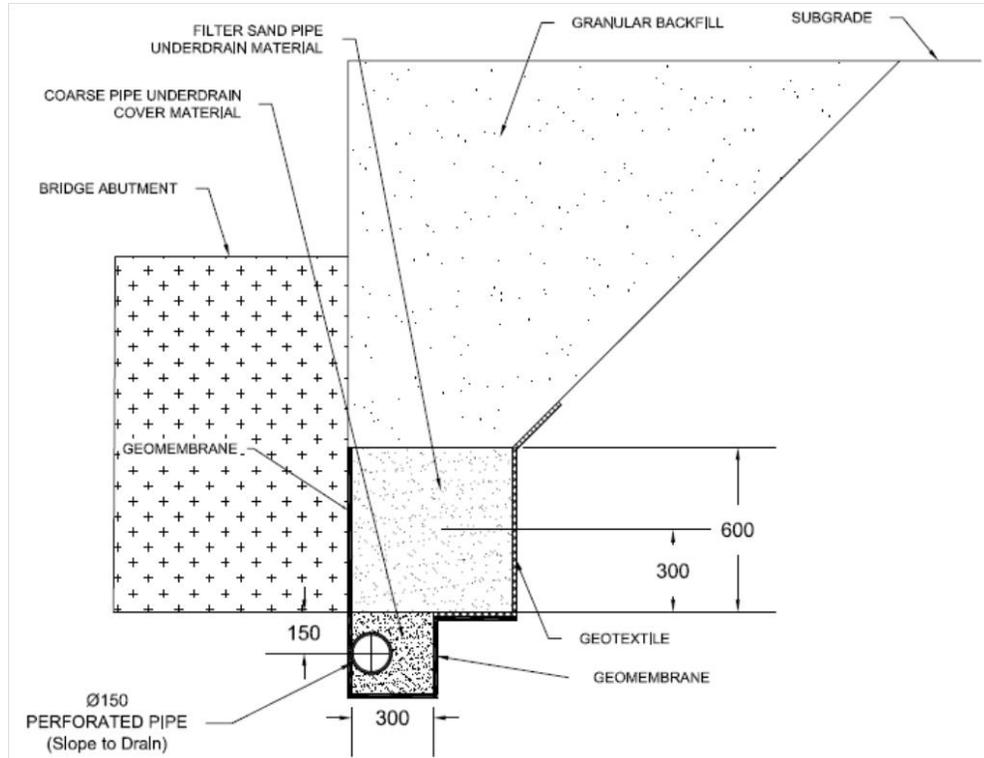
Schematic Cross-Section View of Hydraulic Short Circuit that Can Develop in the Abutment Drainage System
